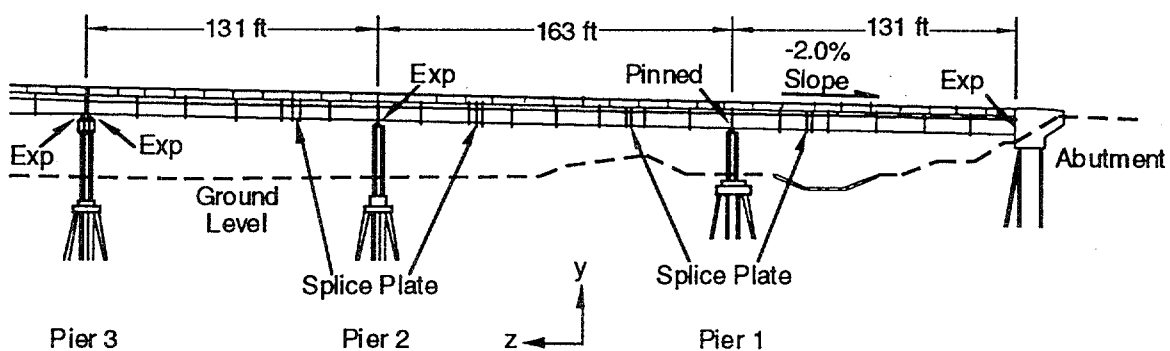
Elevation view of the portion of the eastbound bridge that was tested.
